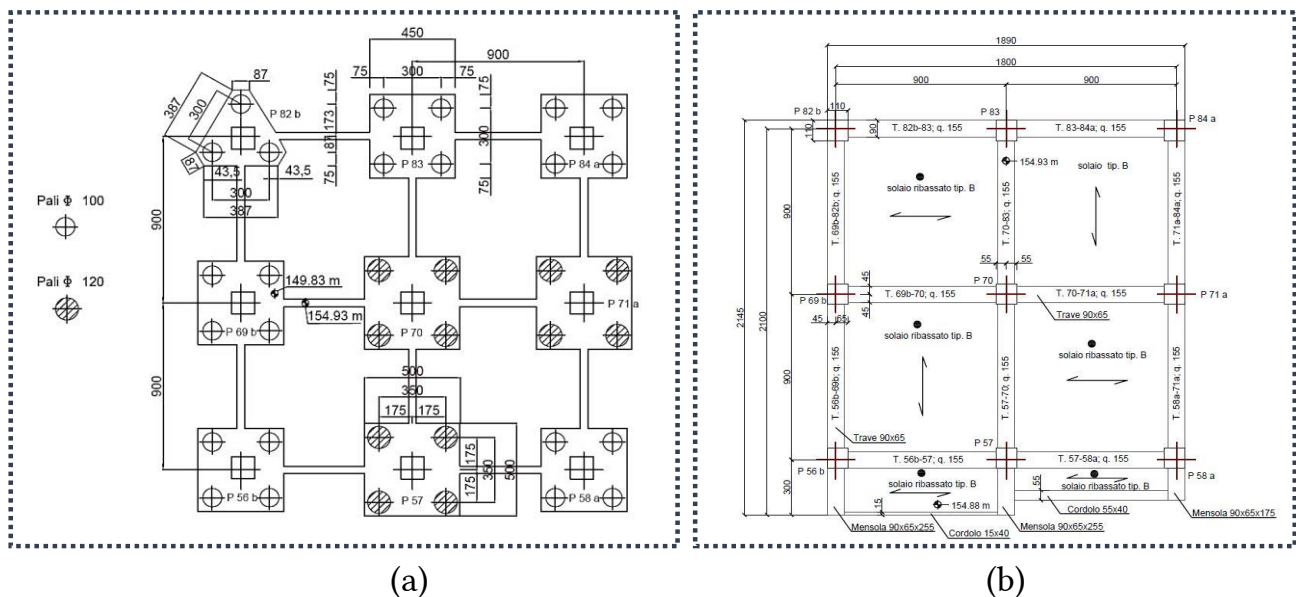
(a) Foundation layout and (b) typical plan floor.
